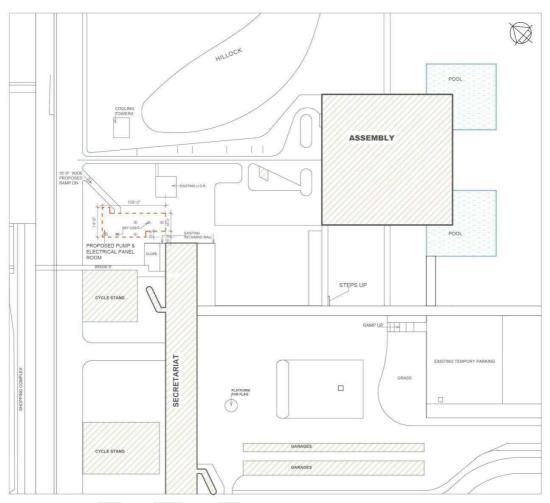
Location of Proposed Site for AC plant Room with Electric Substation and Cooling tower
